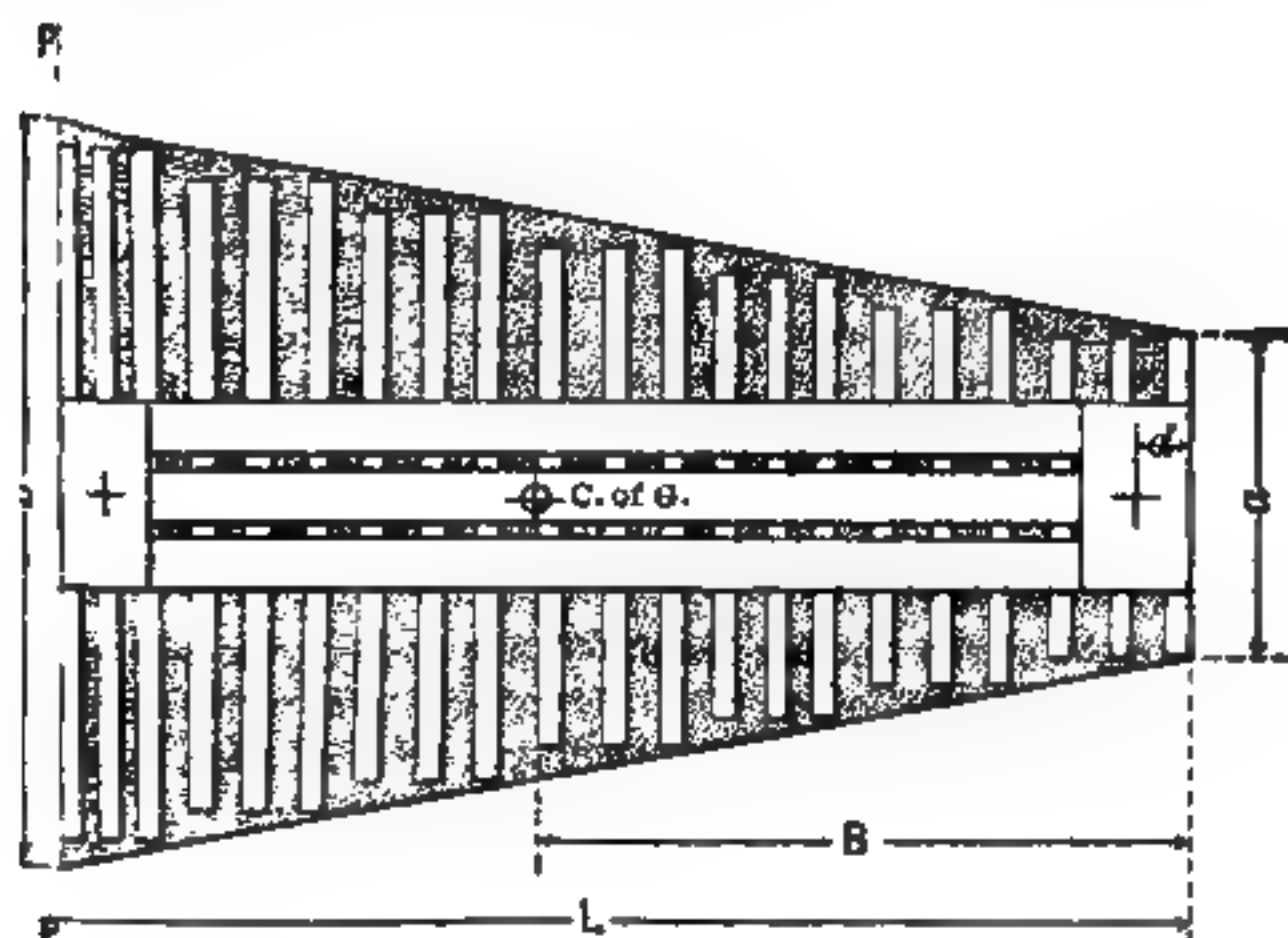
Girdering-method of Foundations. Two Unequal Loads
